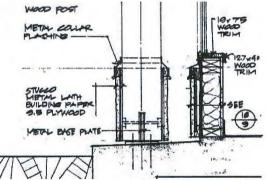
Typical base of exterior column (from Howard Yano Architects).
